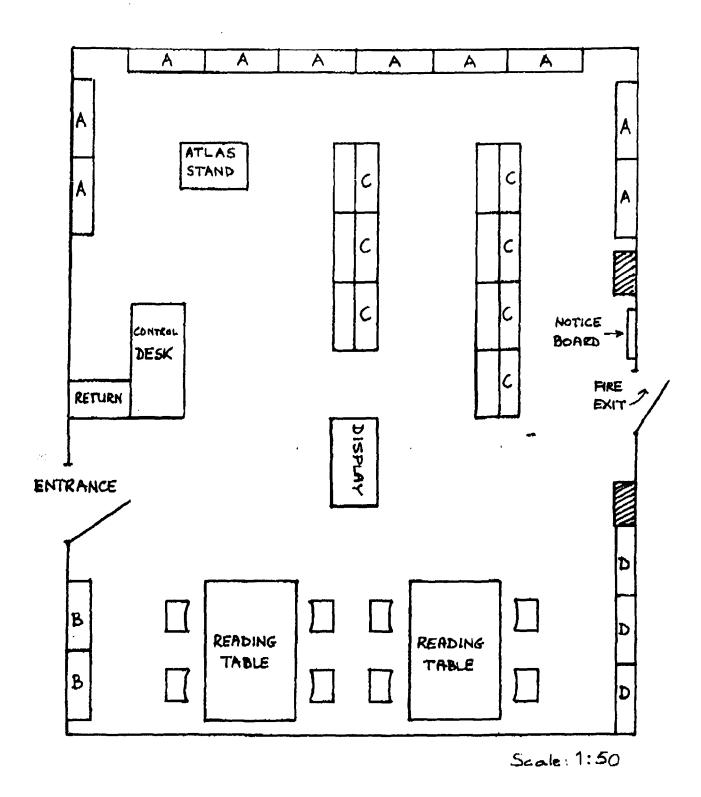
Proposed layout of existing library room (see Appendix B.2 for key to furniture types)
